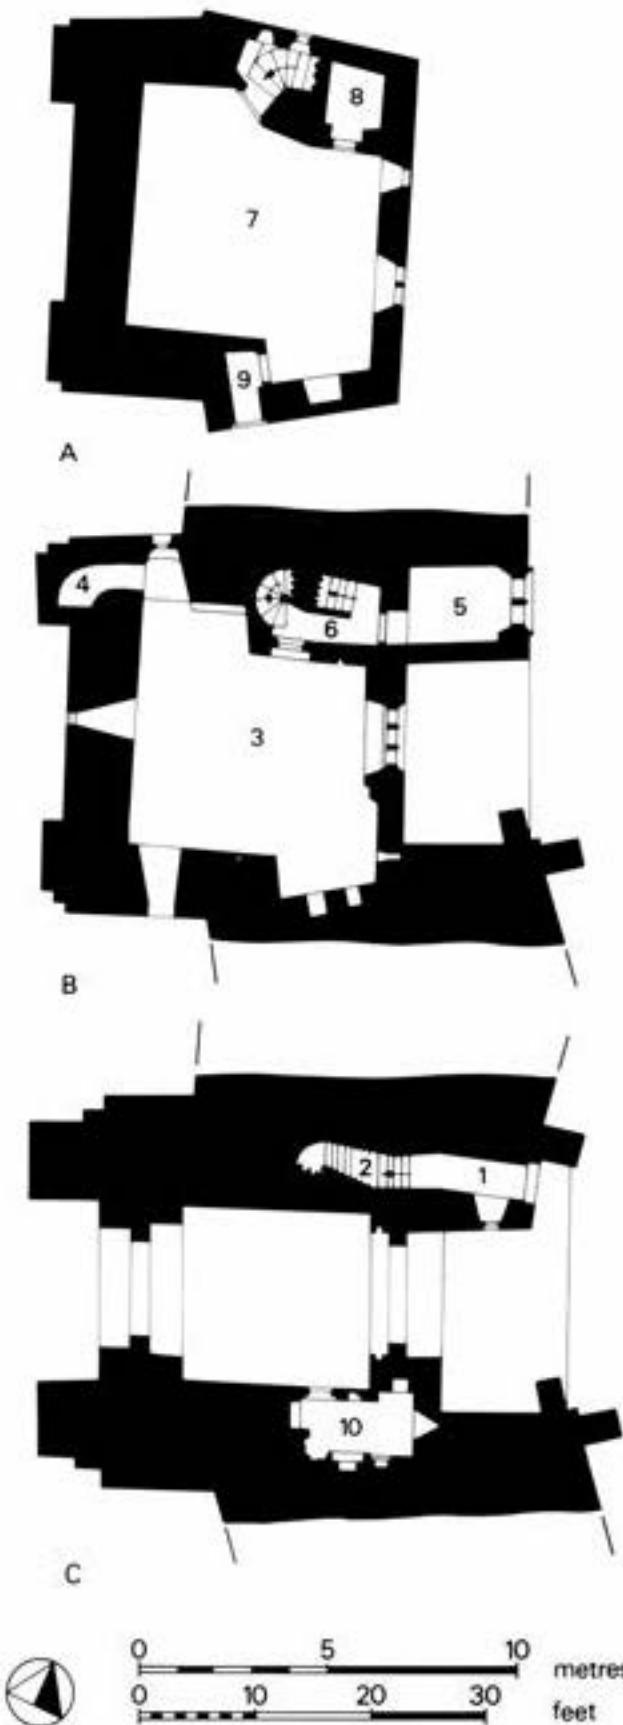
The inner gatehouse; plans at (A) second, (B) first, and (C) ground floor level
